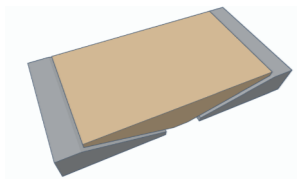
Kusabi prototype inspired by the wedge connection system used in the Oo-Yane Ring structure.
